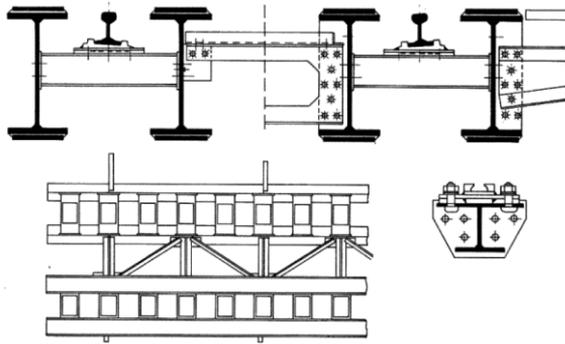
Bridge-type relief structure; main girders composed of twin beams (Miklin & Sawicki, 1993; Rybak, 1982)
